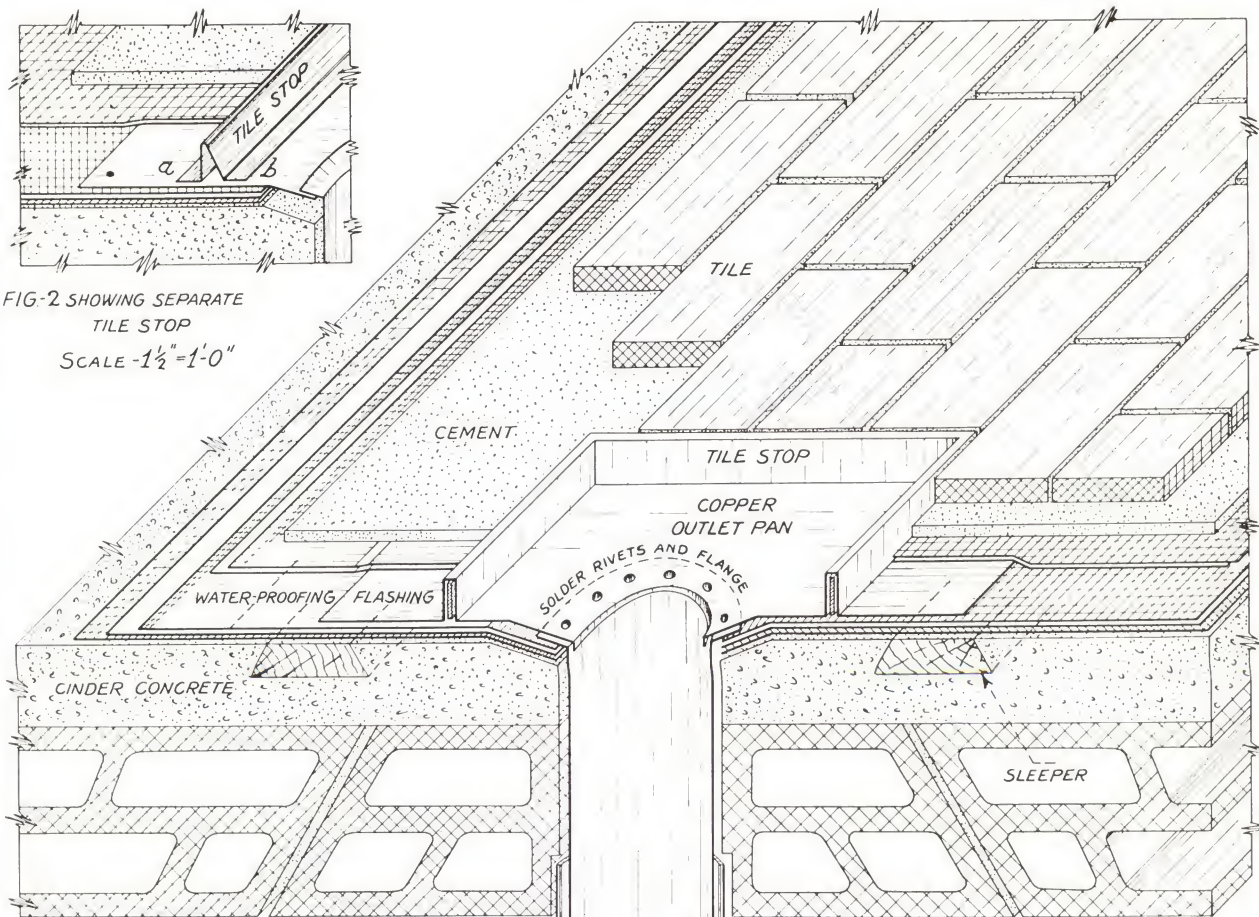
METHOD OF FLASHING AND CONNECTING
